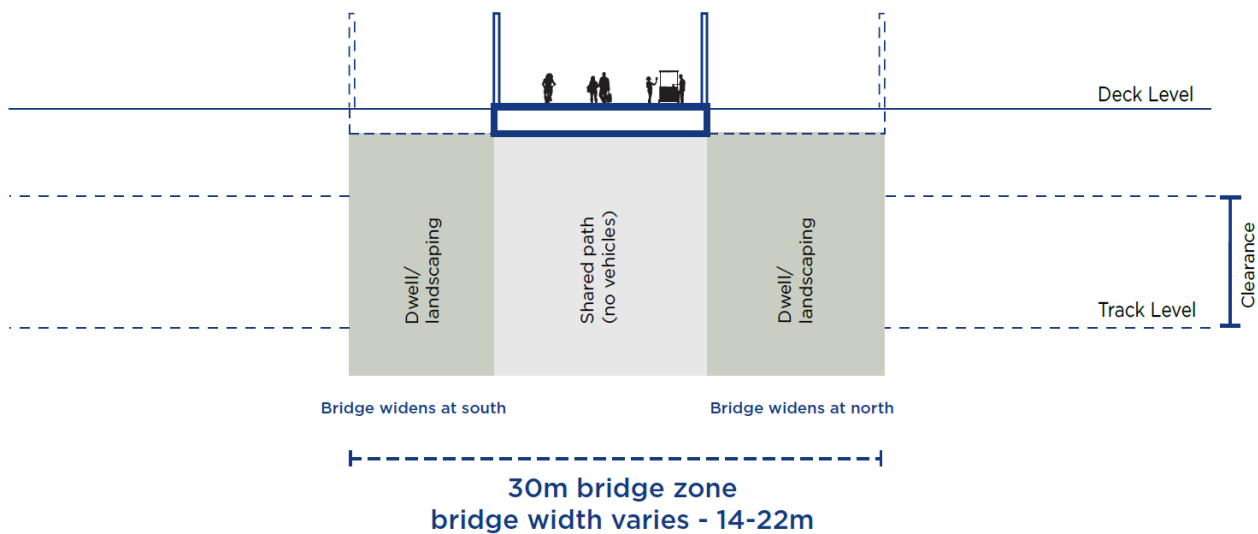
Typical cross-section 8, Devonshire Street Bridge
